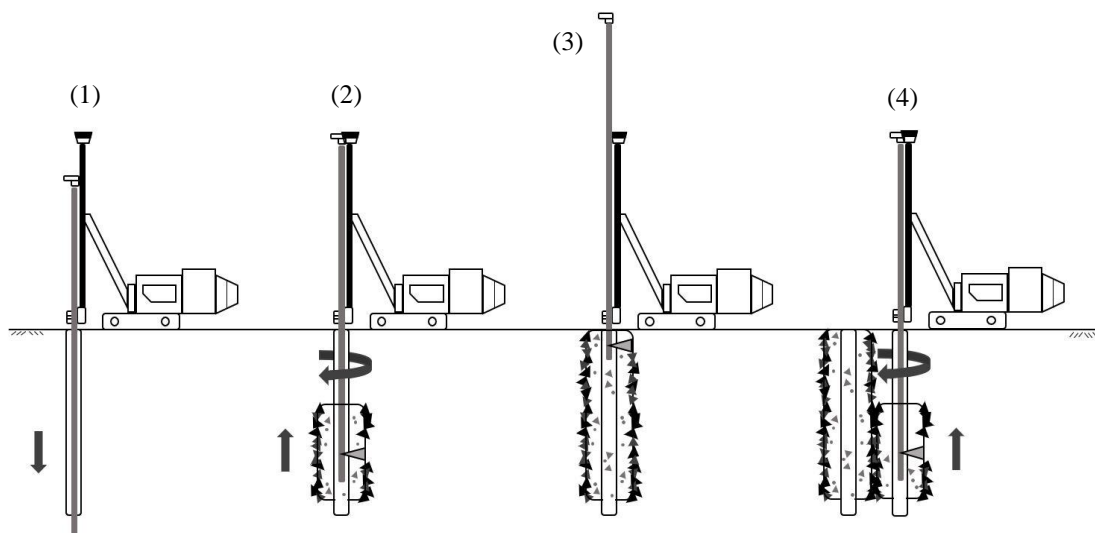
The general steps of the jet grouting procedure: (1) drilling, (2) jetting and grouting, (3) completion of a column, and (4) overlapping of columns (adapted from Croce et al., 2014).
